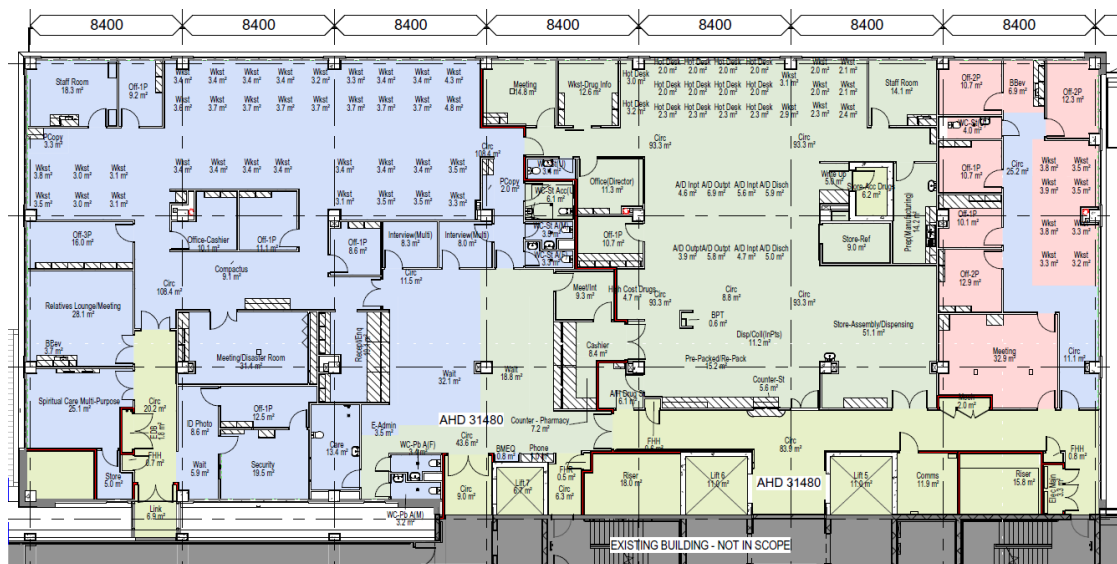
Proposed amended L04 Floor Plan (Source: Conrad Gargett)
